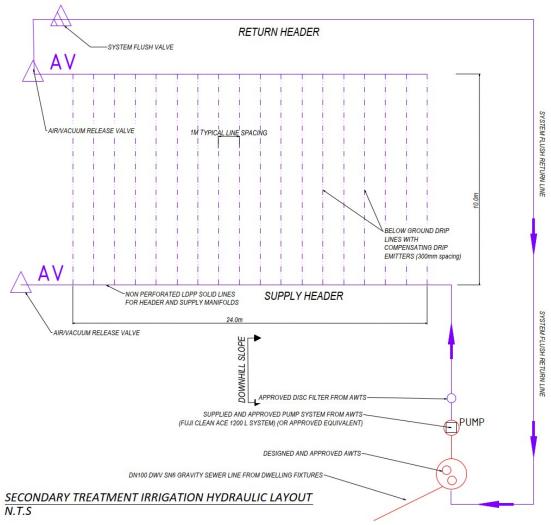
PROPOSED WASTEWATER IRRIGATION LAYOUT
